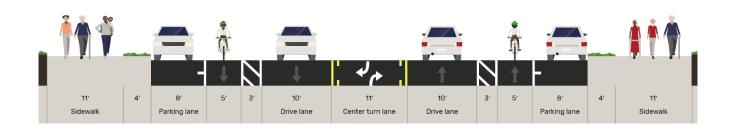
PREFERRED NEIGHBORHOOD COLLECTOR TYPICAL CROSS-SECTION
